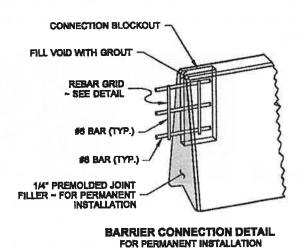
Washington State's rebar grid connection for its tall single slope barrier Source: WS DOT C-13 sheet 1
